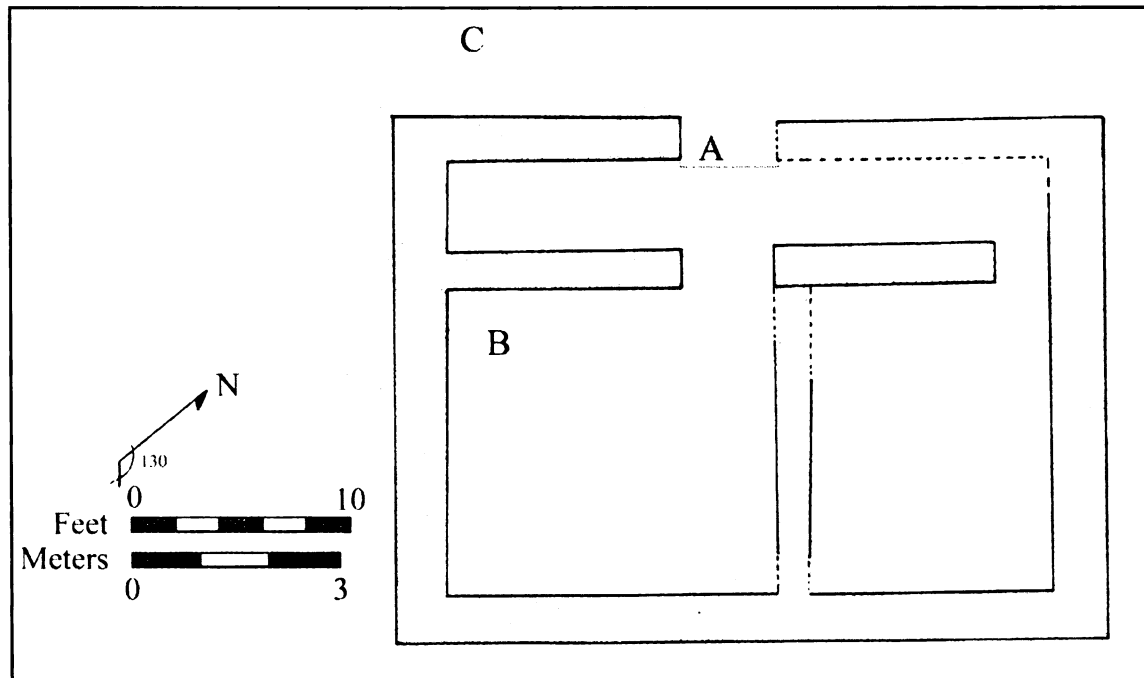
SJ4KD5/16-1. Ridge house foundation plan. A: threshold, step down, slate flooring. B: room with stone flooring, step down through second threshold. No evidence of steps remain at entry to B.
